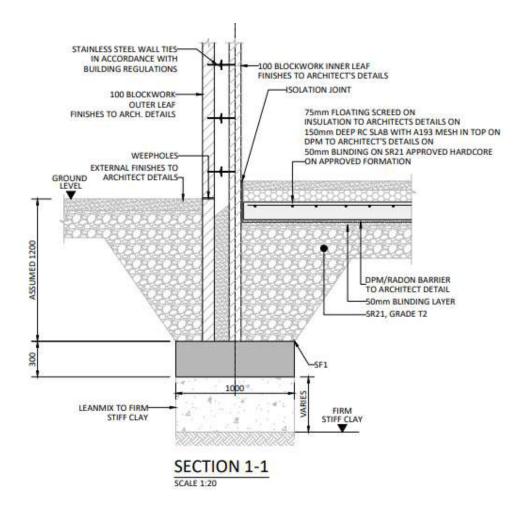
Typical Section through Strip Footing for Block Retaining Walls
